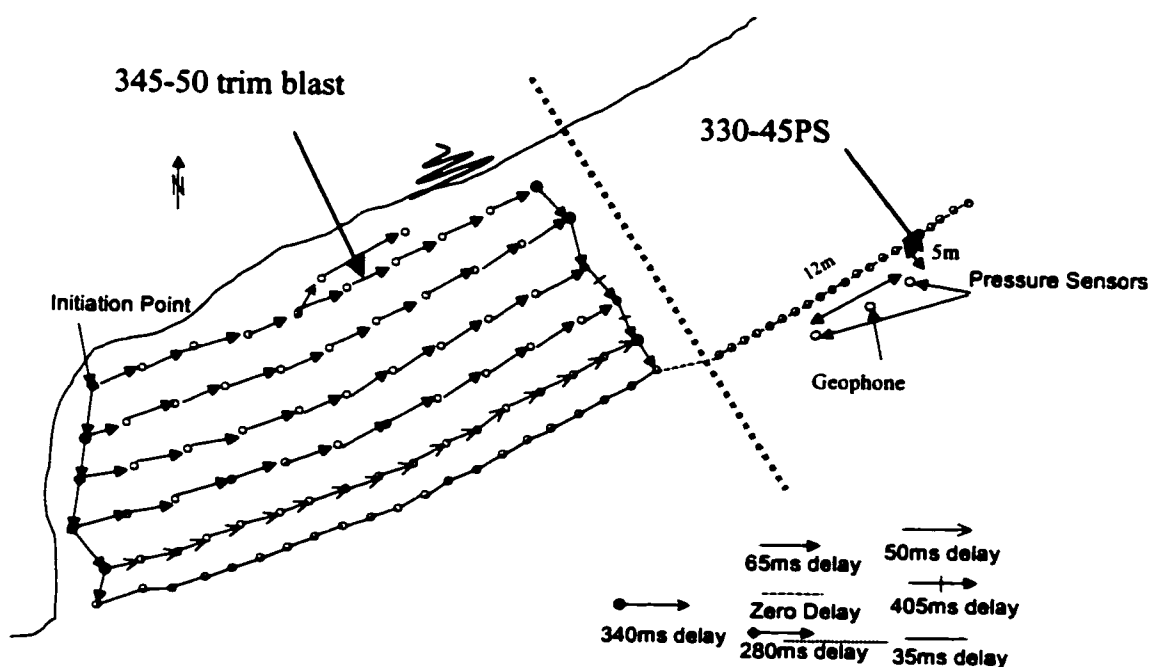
Plan view of 330-45PS pre-shear and 345-50 wall control blast
